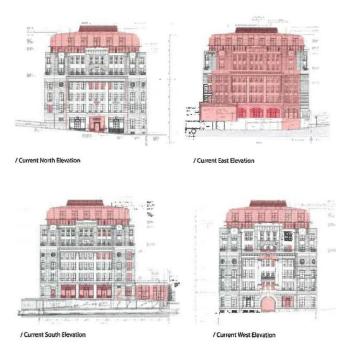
Previous alterations to the former Parcel Post Building facades shown in red
